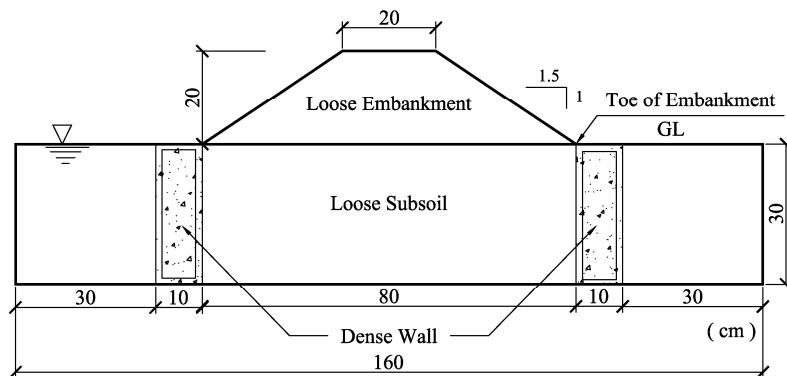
b – Model moist loose embankment and loose subsoil fully saturated and dense wall made from composite (60% sand and 40% gravel) confined in geo-textile placed on the outside of toe of embankment
